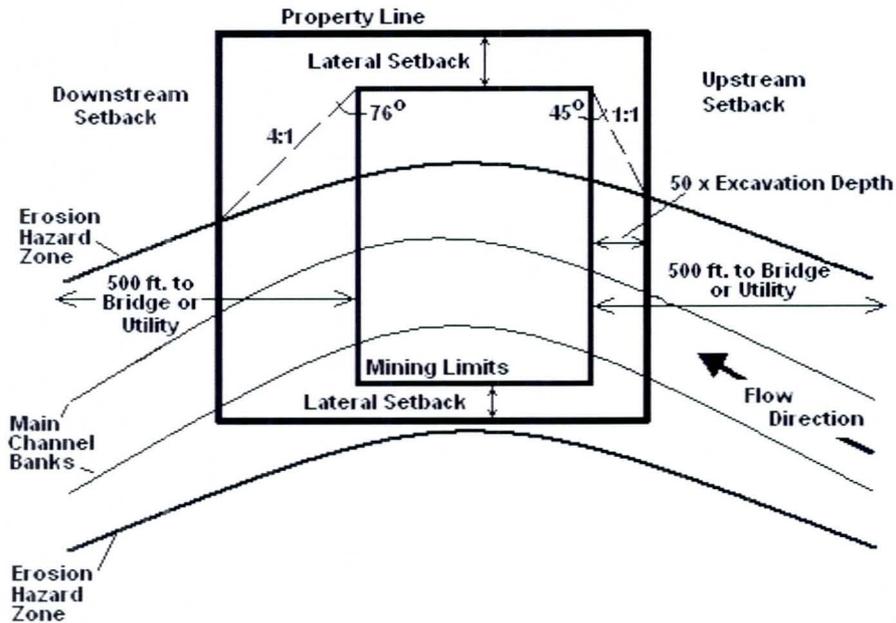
Upstream and downstream setbacks from property lines for excavations that extend outside the erosion hazard zone.
